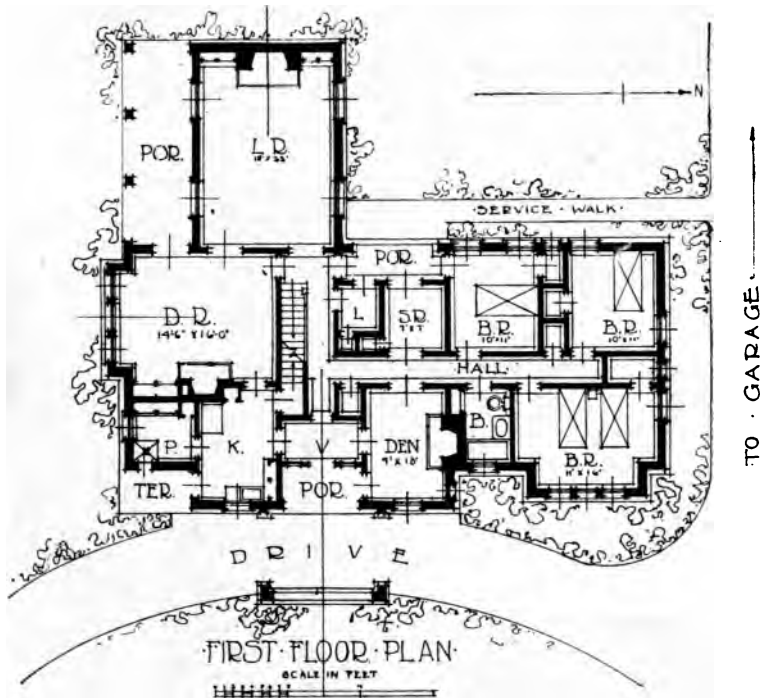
Workman's house. The living room may be planned as a dining room, leaving the dining room as a down-stairs bedroom, if needed.
